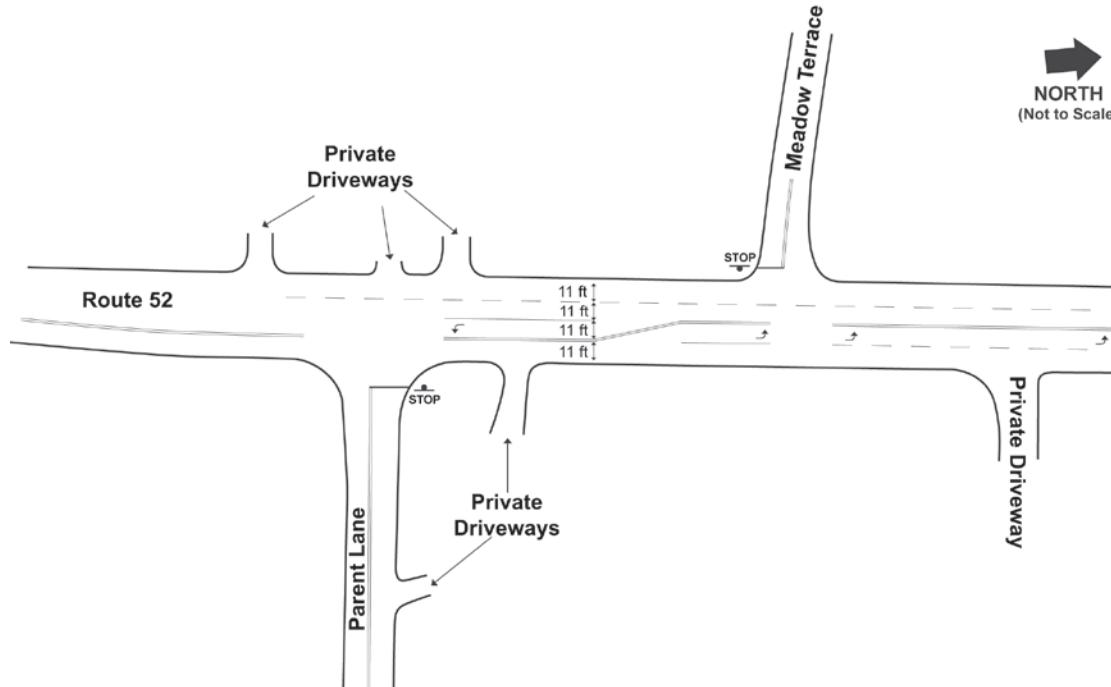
illustrates the final design at the Meadow Terrace/Route 52 and Parent Place/Route 52 intersections. The design maintains two 11-ft travel lanes in the southbound direction and one 11-ft travel lane in the northbound direction, and provides back-to-back 11-ft exclusive left-turn lanes. A transition taper of approximately 75 ft separates the left-turn lanes. Approximately 75 ft of vehicle storage is provided in the southbound left-turn lane at Parent Lane, which is sufficient to accommodate three passenger cars, or one tractor-trailer and one passenger car. Approximately 50 ft of vehicle storage is provided in the northbound left-turn lane at Meadow Terrace, which is sufficient to accommodate two passenger cars
